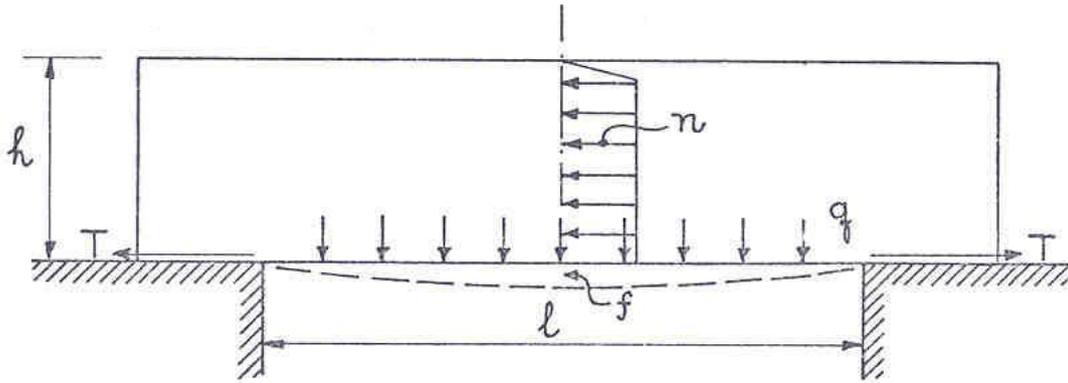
The Reinforced Earth[®] serves as a foundation slab, using longitudinal and transverse reinforcing strips within the granular backfill.
